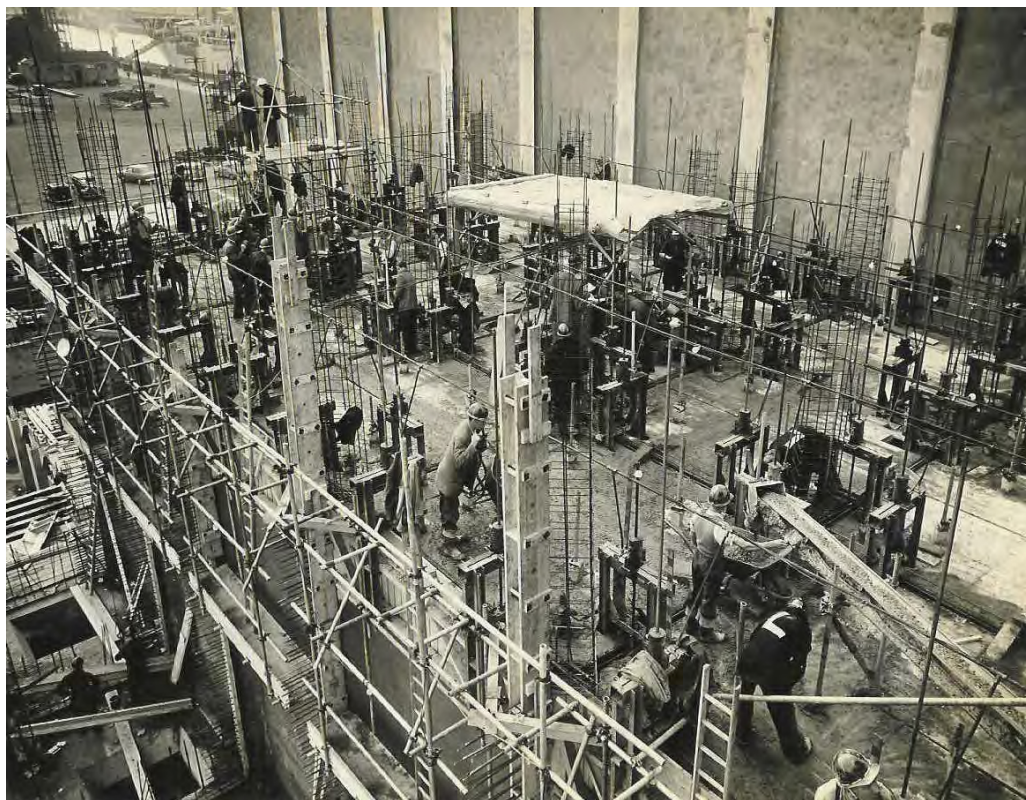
General view of a deck under construction with concrete supplied on a conveyor belt
